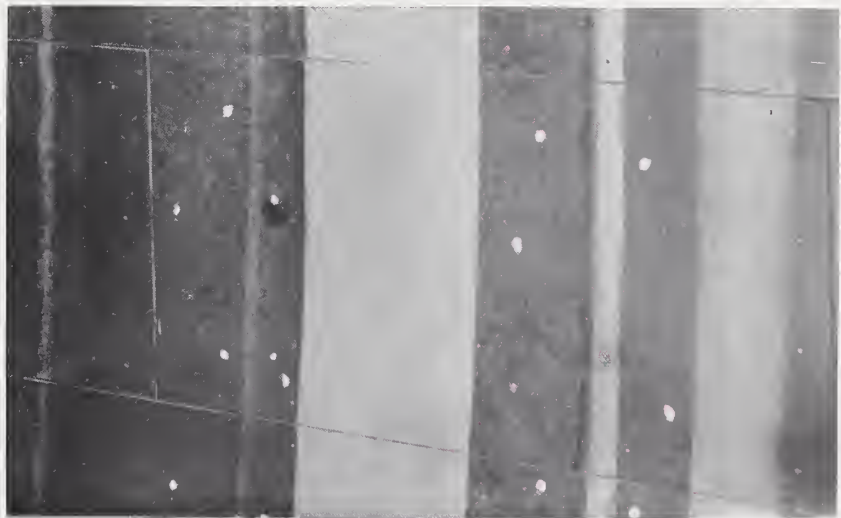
$\frac{1}{8}$ -in. pressed fiberboard on wood subfloor (test panel 14R).
